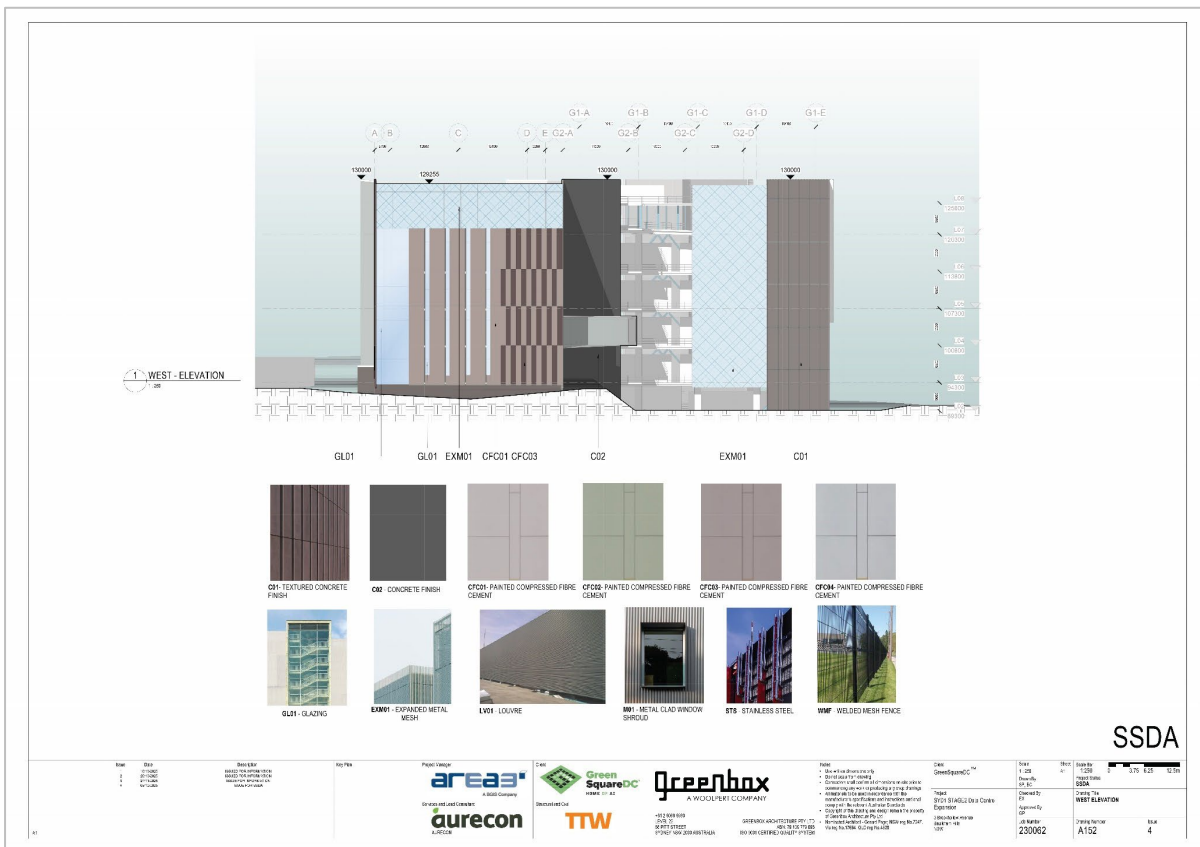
Western Elevation (Source: Greenbox. 2025).
